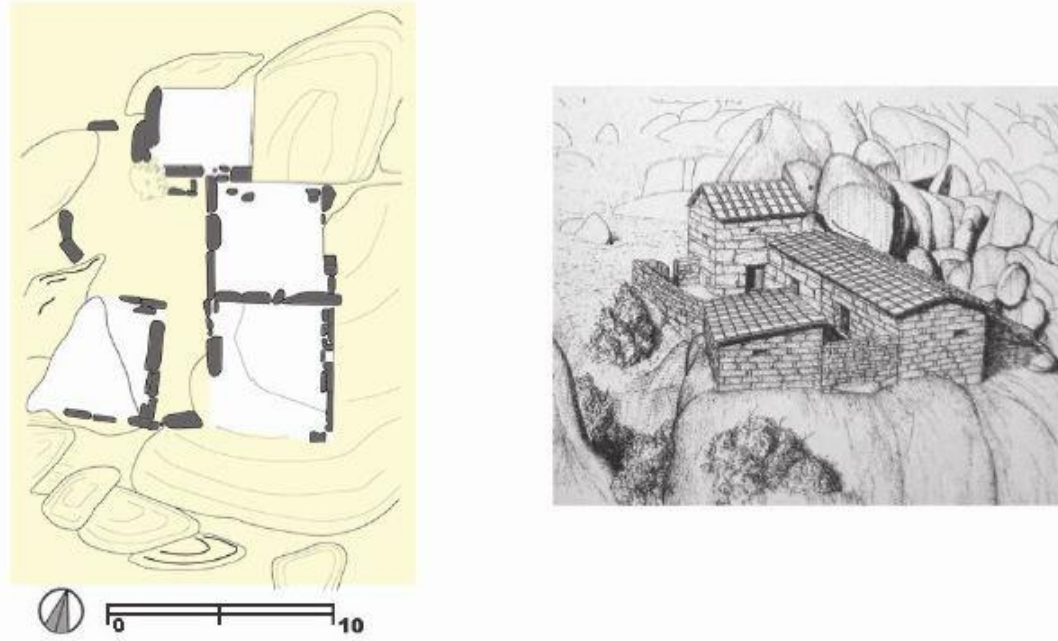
Latmos rock house plan and reconstruction. (Gönül 2008,138)
